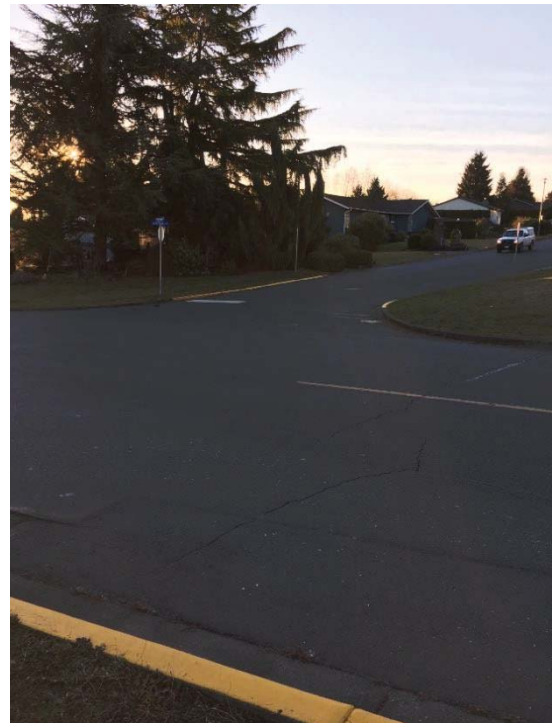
Lack of sidewalks on the south side of Forest Park Rd. at Haro Park Ter.
